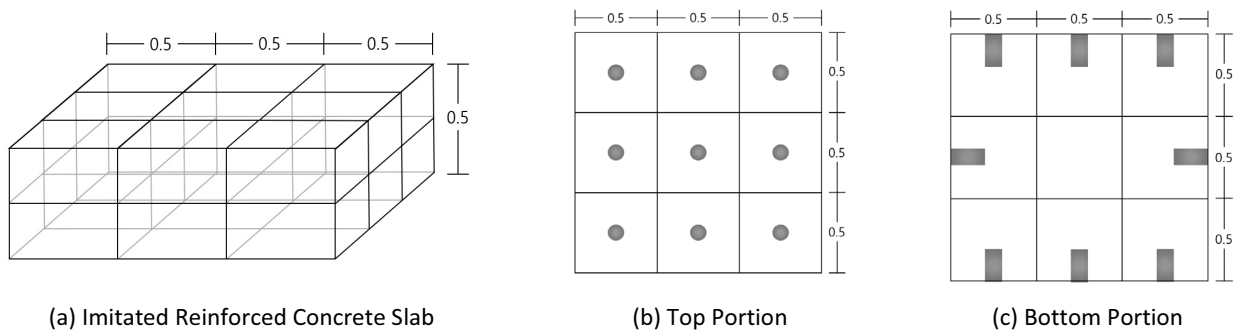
Schematic illustration of imitated concrete slab and coring locations(Unit: m)
